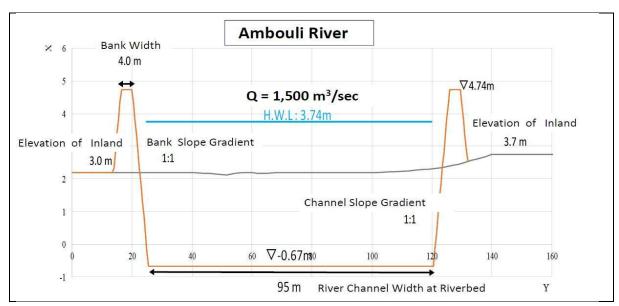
Typical Cross Section for Alternative 1 A (Q=1,500 m3/sec)
